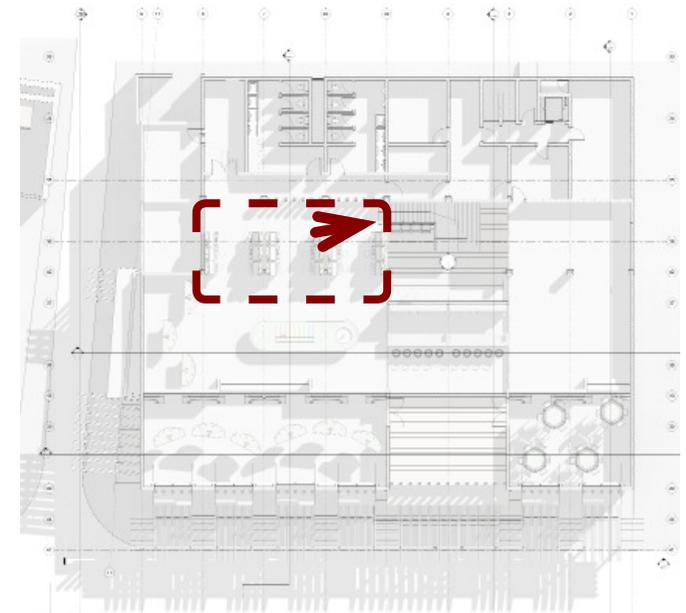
First floor plan of gaming facility Showing services and prive.
